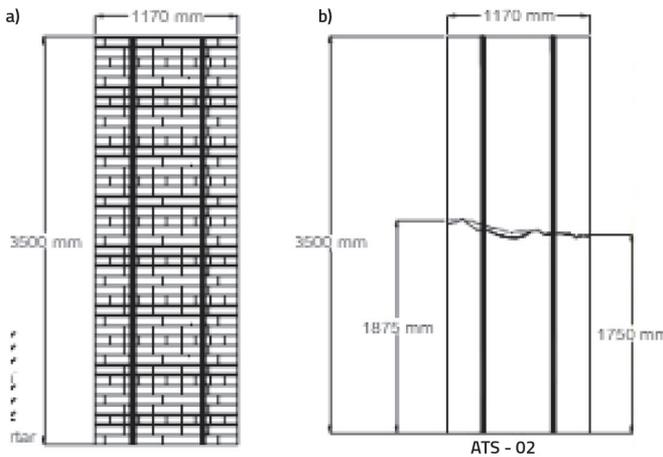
a) Retrofit detail; b) Failure mode of the test wall [8]
